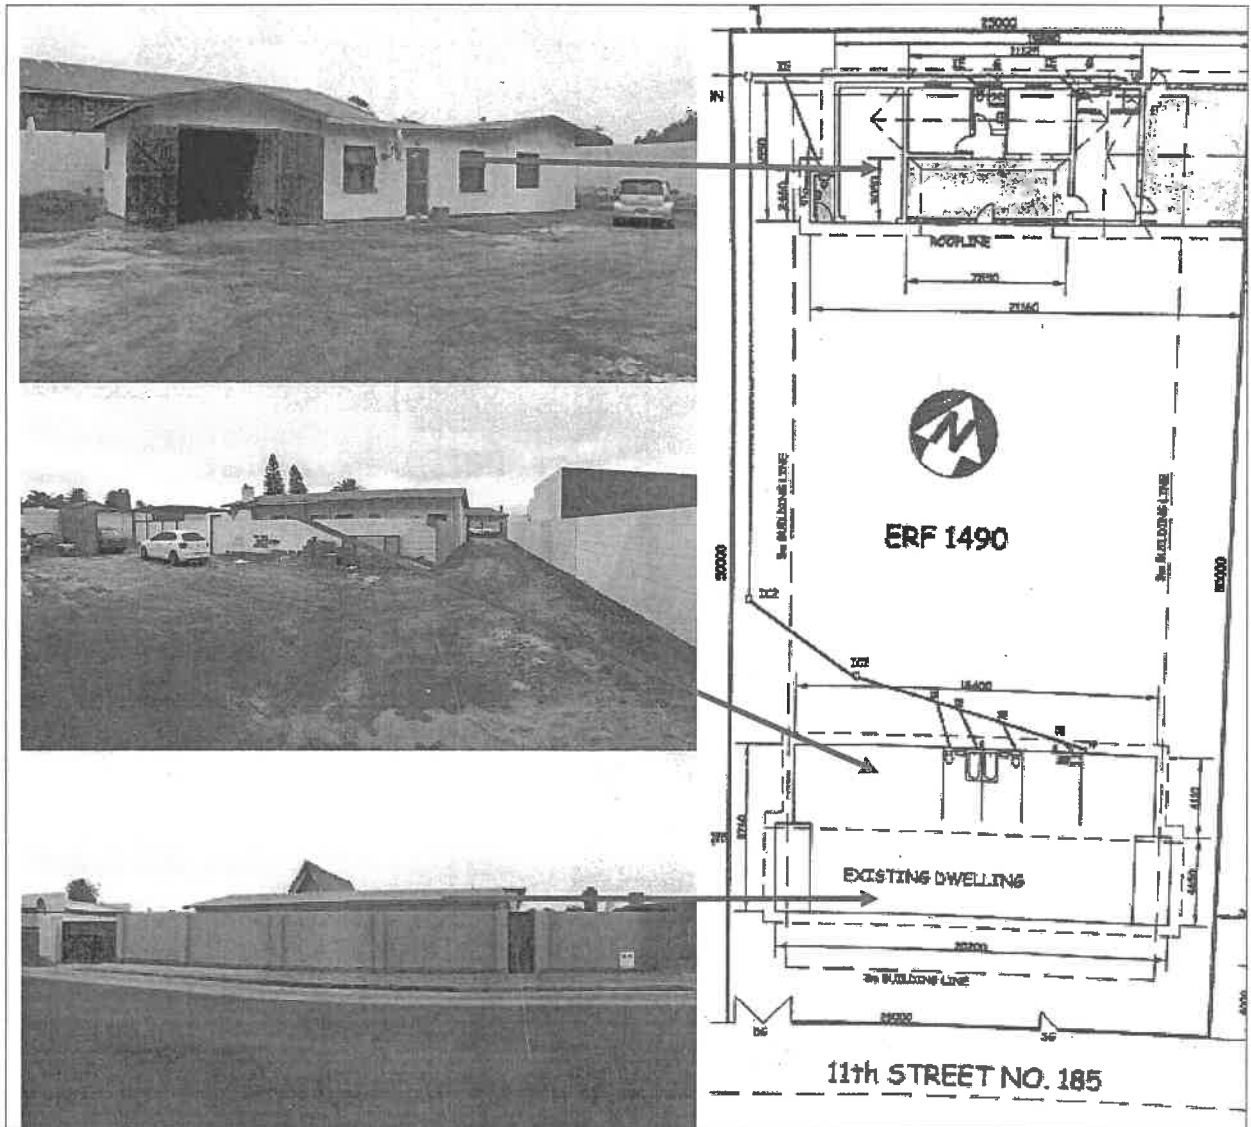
Existing Land Uses on Erf 1490 Walvis Bay
